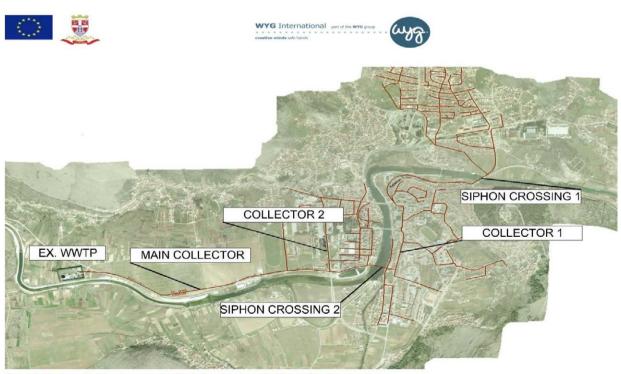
Layout of key components of existing sewage collection and treatment system
